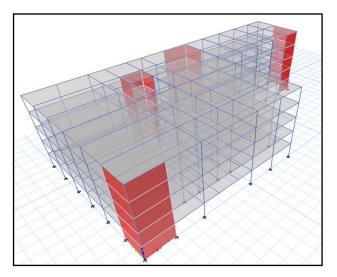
Model 5: Diagonally placed L shaped shear wall -L2
